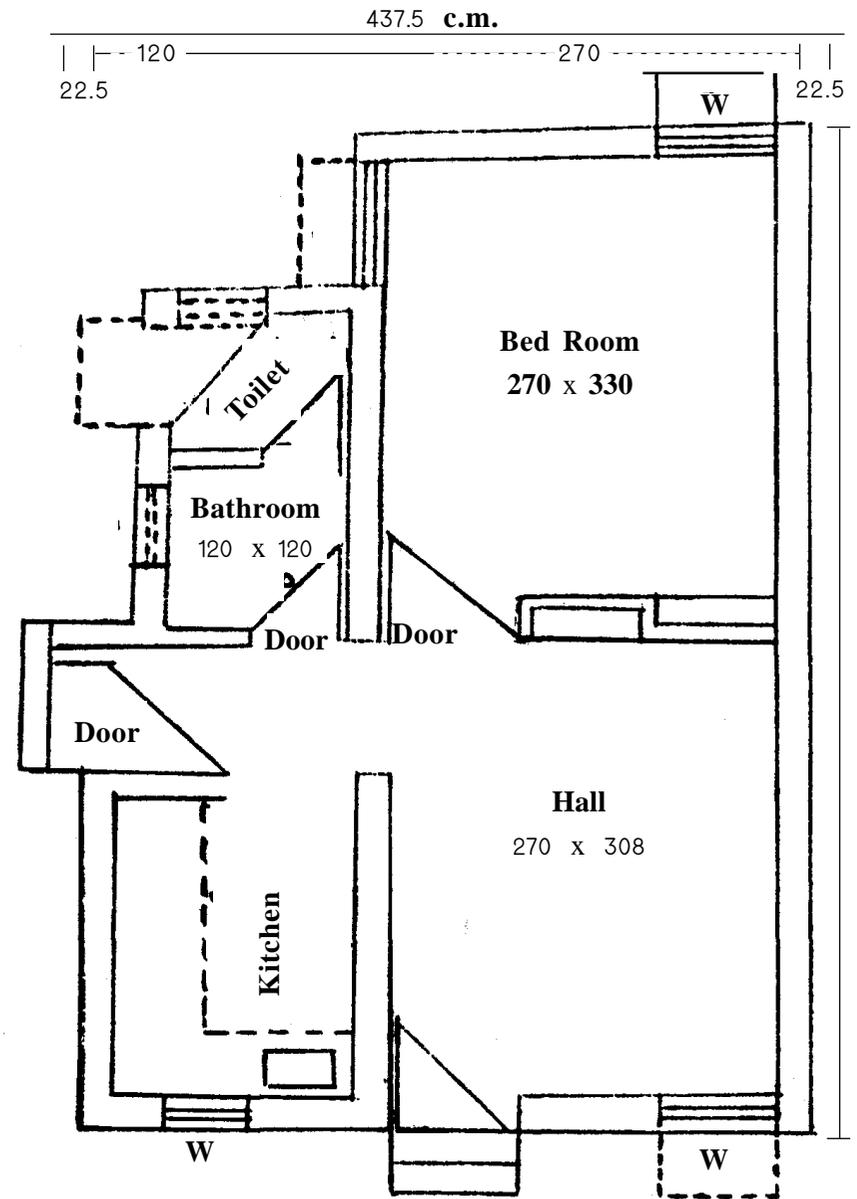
Low income group house plan Plinth area 386 sq.ft
